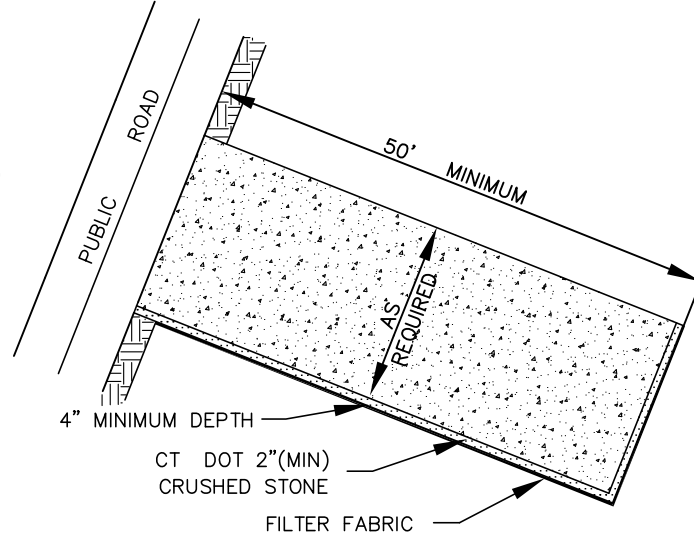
DETAILS APPLICABLE WHERE INDICATED ON PLAN
